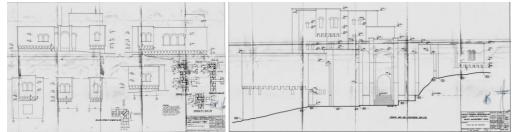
(Left: façade fragments and details), Right: main façade) ; (Archive of the Construction
